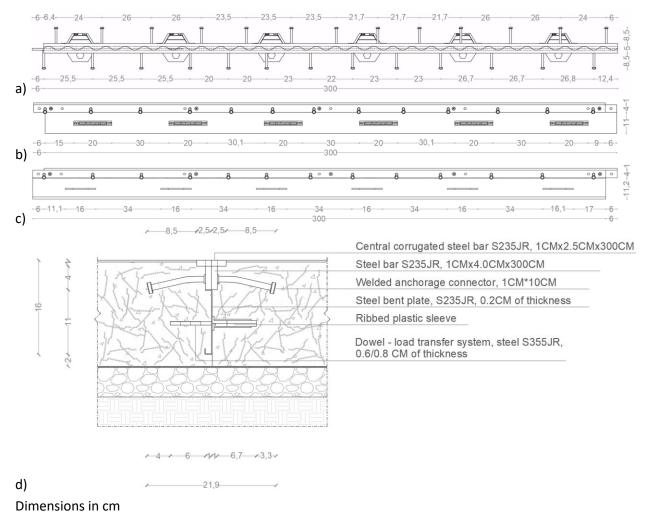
Detailed drawings of the StrongJoint Simple Wave: a) Top view; b) Right side view; c) Left side view; d) Cross-section view
